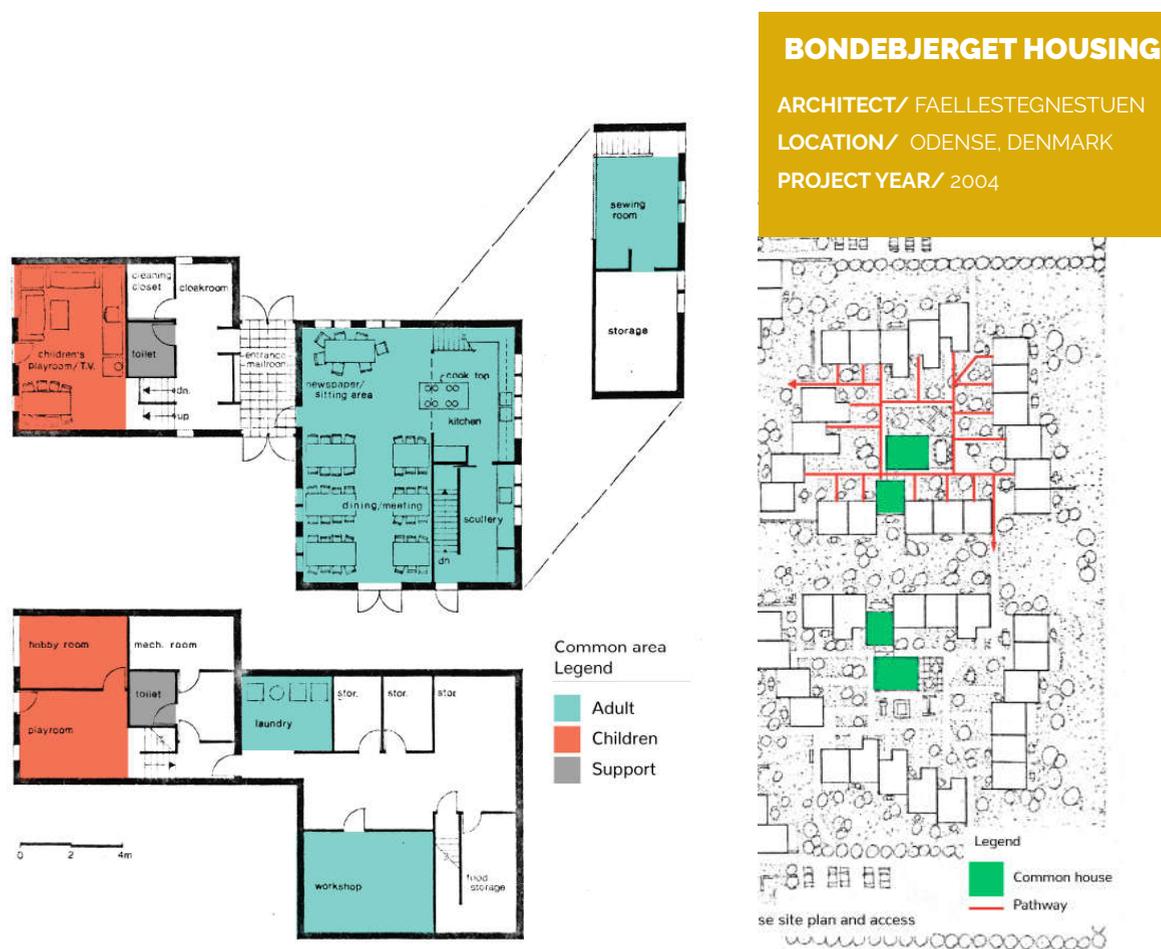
Bondebjerget common house floor plan in Odense, Denmark
